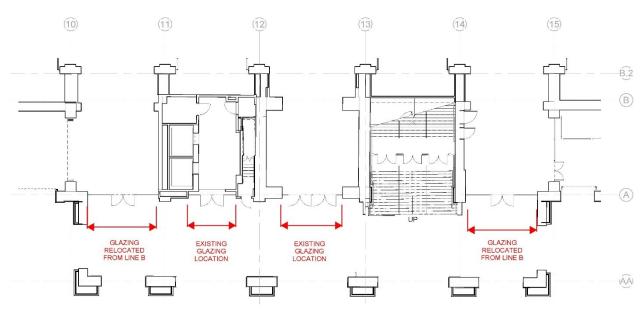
Proposed glazing locations at entry portico. New glazed walls and doors identified with red arrows.
